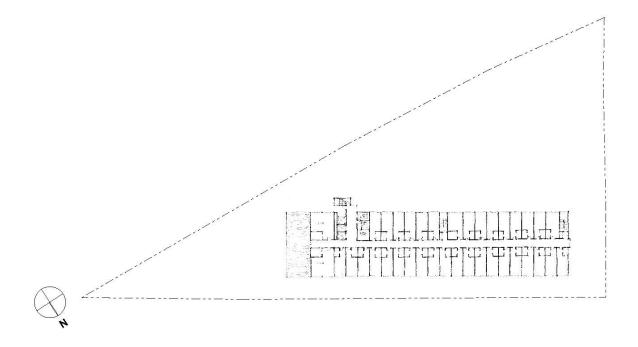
Gunnedah Hotel Master Plan – First Floor (EJE Architecture)
